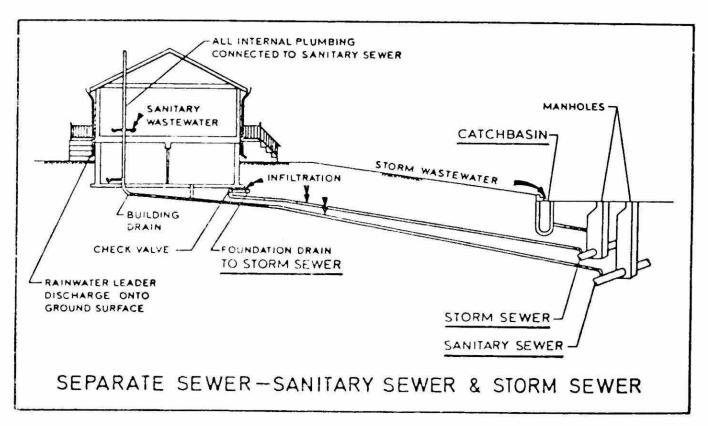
BUILDING CONNECTIONS - SEPARATE SEWERS
